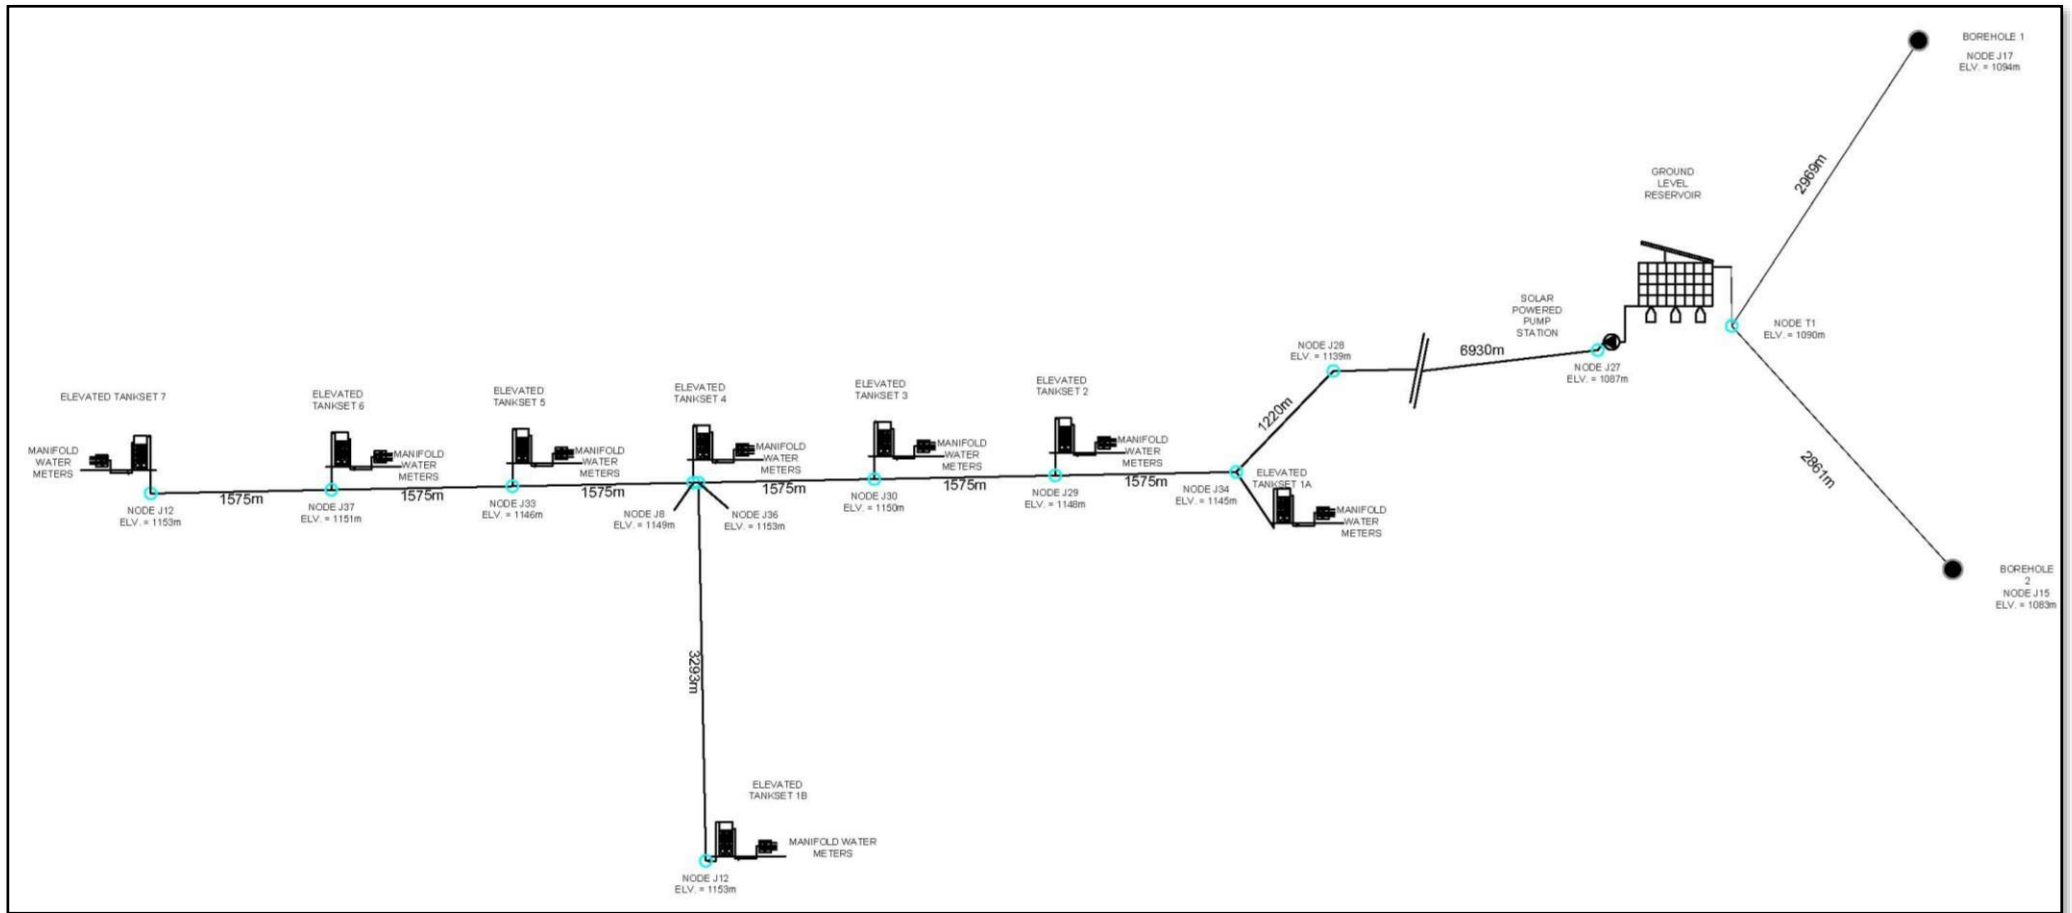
Schematic Layout of the Proposed Eiseb West Water Supply Scheme
